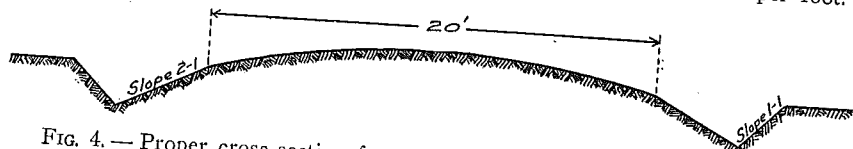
Proper cross-section for a clay road. Crown 1½ inches per foot.
